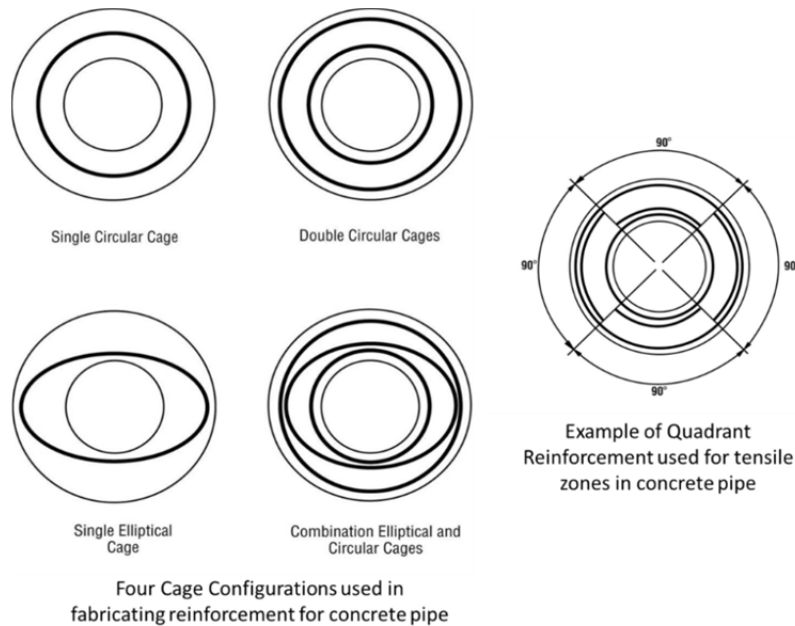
Examples of cage configurations commonly used in reinforcing concrete pipe.
